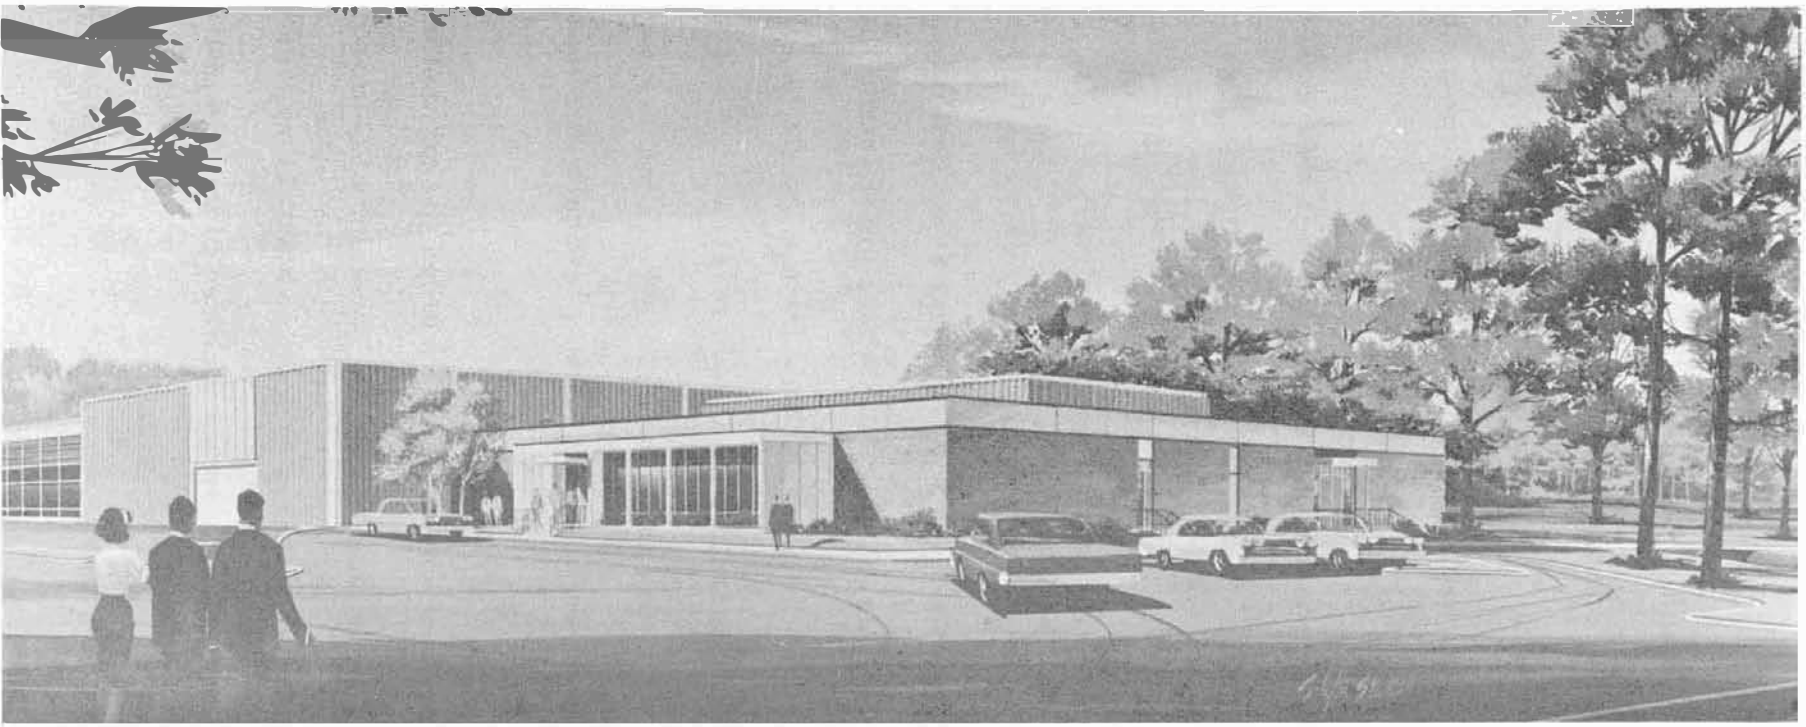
IBM BUILDING #2 ADDITION (ARTISTS CONCEPTION)
